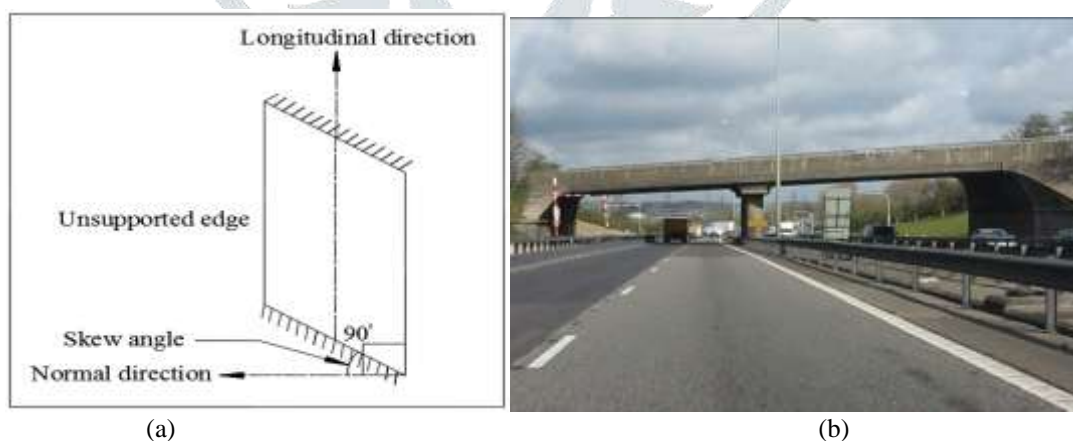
(a)Skew bridge sketch (b) Photo of skew bridge
